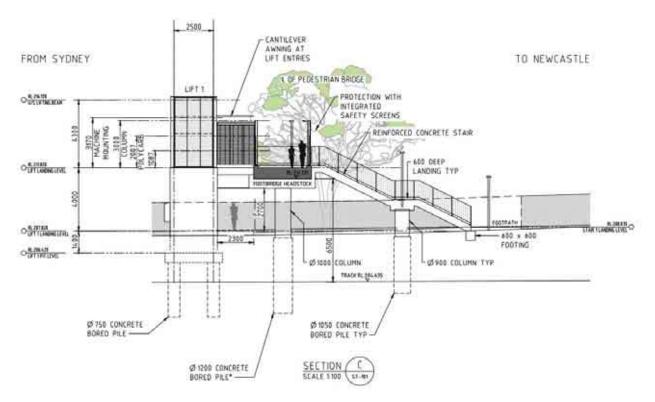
End elevation of the bridge, showing lift and stair structure
